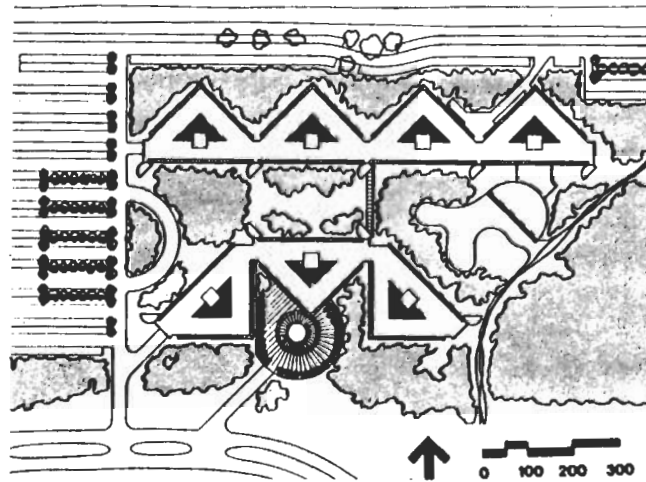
PLAN OF SHELL WOODCREEK HOUSTON FACILITY
